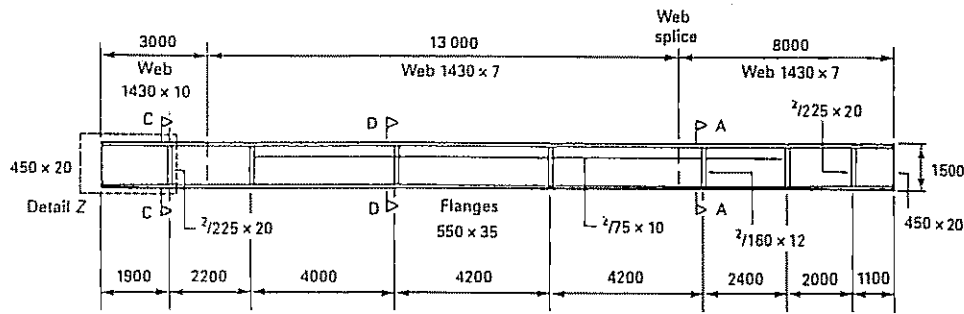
Details of stiffened plate girder - utilizing tension field action
